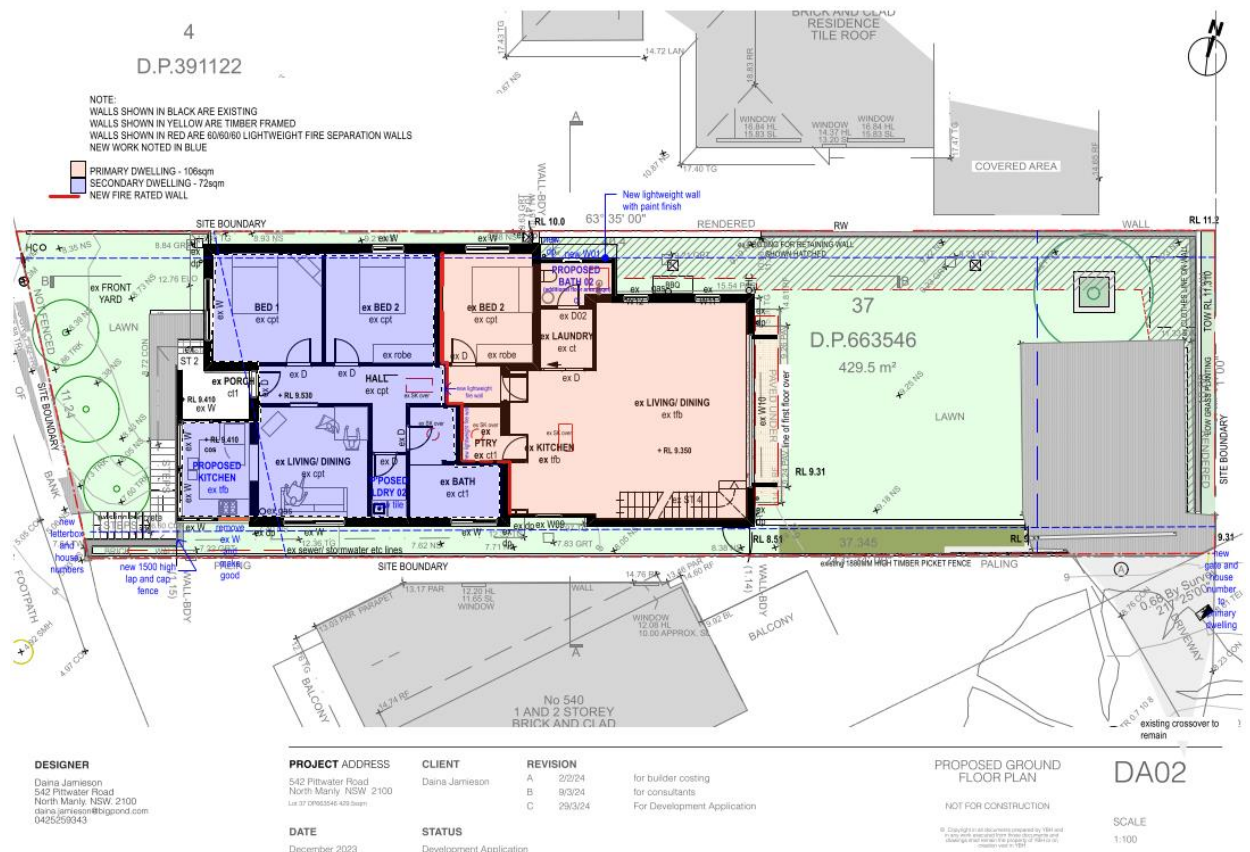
Extract form DA plans showing separation of spaces between dwellings on ground floor.
